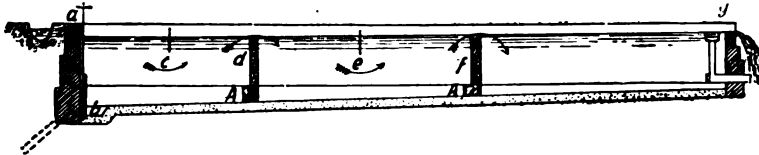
Sedimentation Tanks adopted in England. Longitudinal Section.
